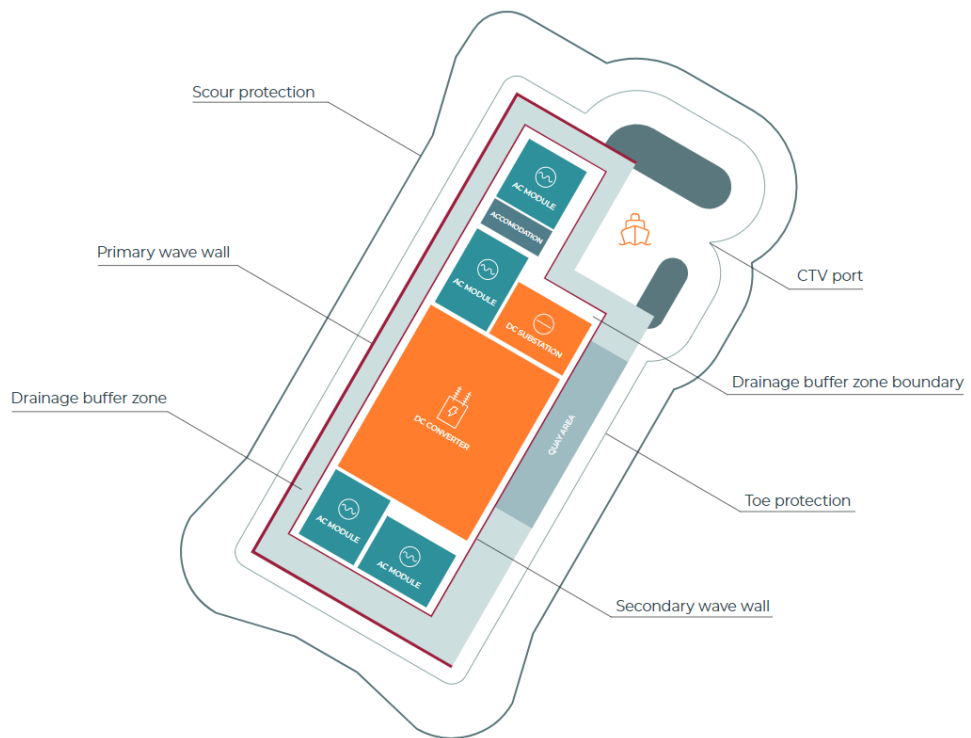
Island layout (showing indicative layout; the final layout and dimensions can still be optimized during the detailed design)
